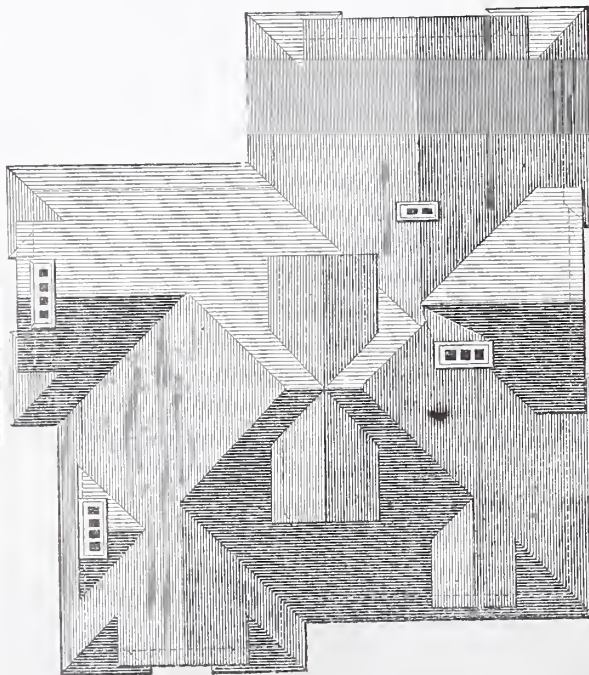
Roof Plan Accompanying Elevations Shown in the Preceding Pages.—Scale, 1-16th Inch to the Foot.
